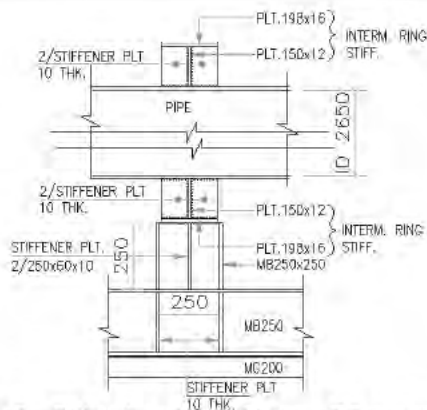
Side elevation of beam B2 supporting the pipe and its stiffener T-ring
